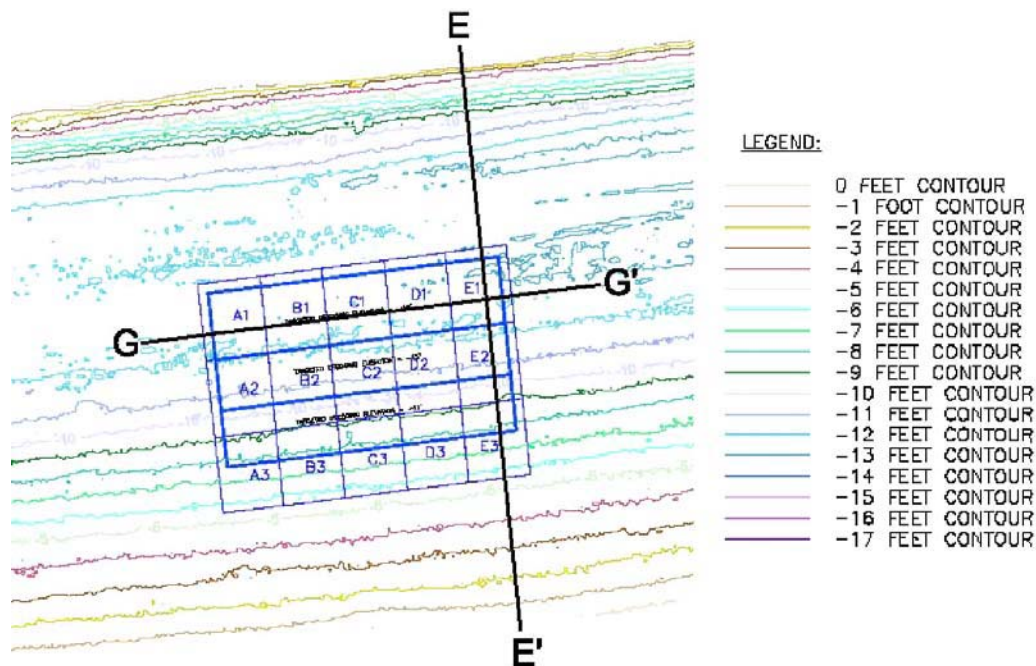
Dredging Plan and Cross Section Locations (E-E' and G-G')
